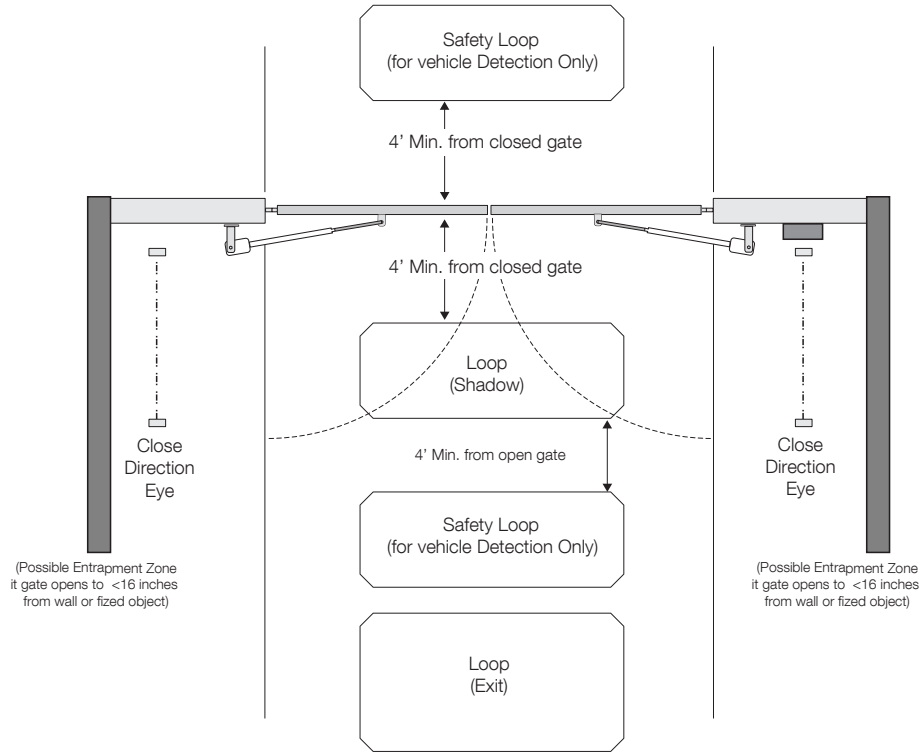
LAYOUT FOR IN-GROUND LOOPS
